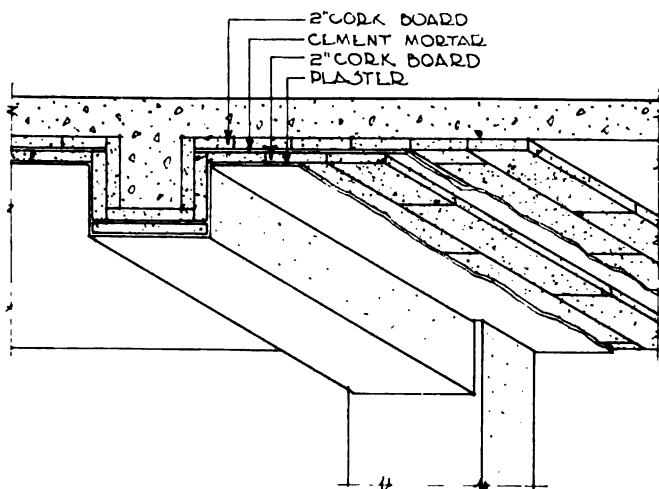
DETAIL OF INSULATION ON CONCRETE CEILING.
